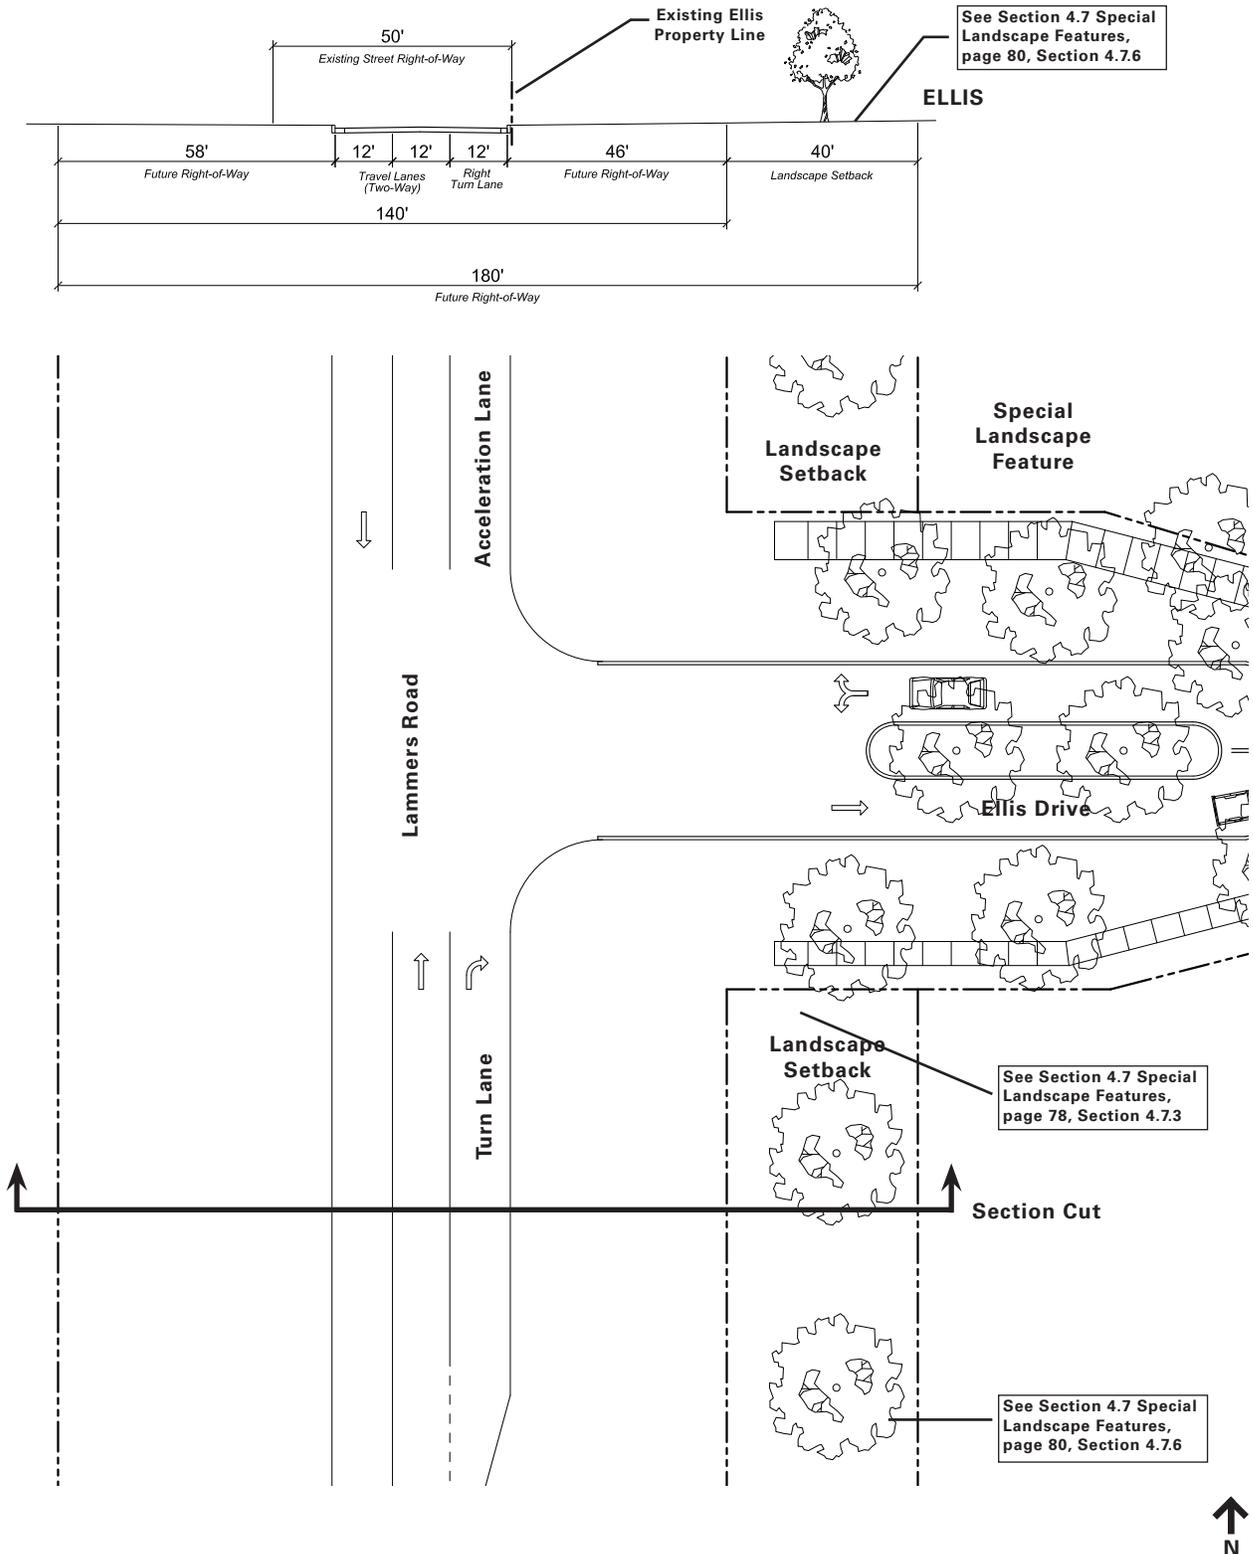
Existing Section and Plan: Regional Arterial – Lammers Road, Designation A (Cross-section at the time of connection of Ellis Drive to Lammers Road)
